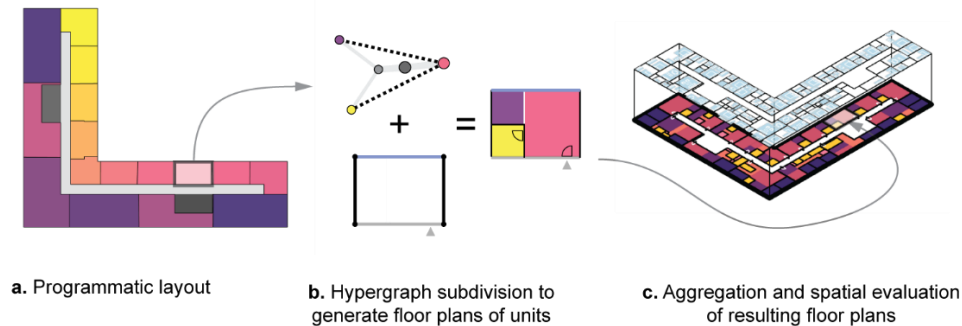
Creation of floor plans from programmatic layout (a-c)
